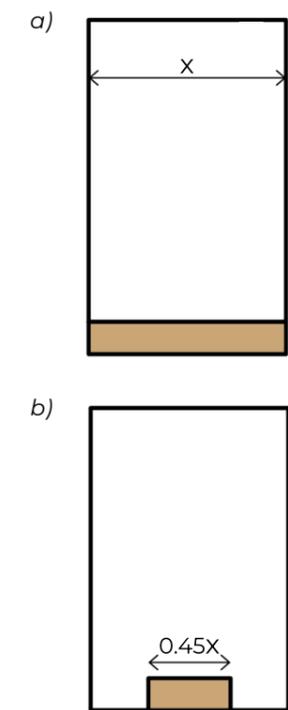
Floor plan view for two types of sunspace design based on Aelenei, 2014
